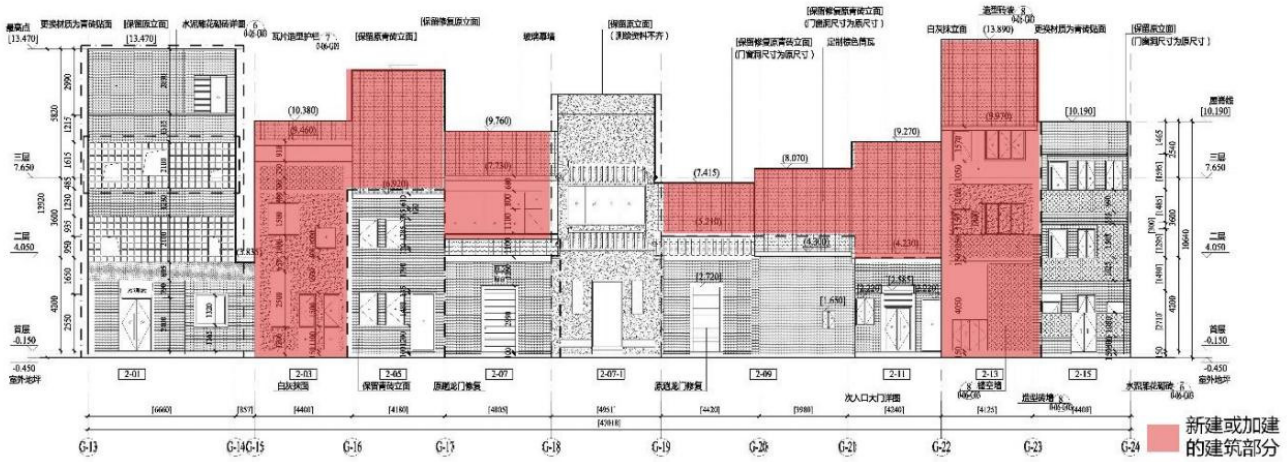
North elevation of Yongqing Lane 2 (Source: The author reprinted from Vanke materials)
